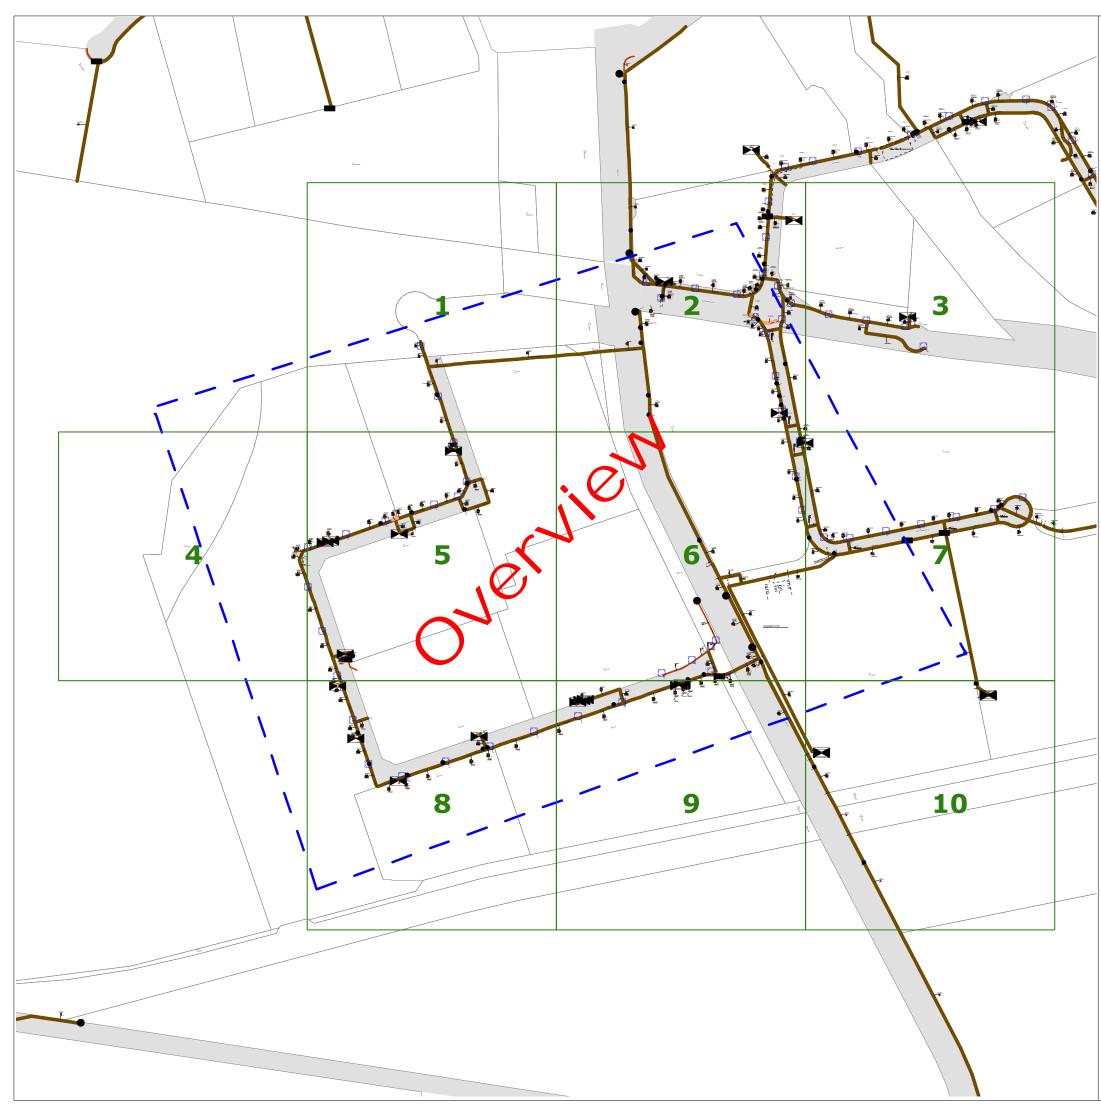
Proposed Stormwater Connection Point – Design by Henry & Hymas
